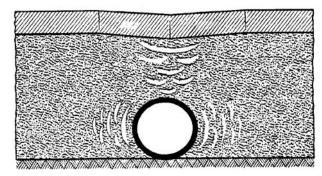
Pavement Failure Due to Inadequate Embedment Soil Compaction or Low-Quality Embedment Soil Adjacent to Flexible Pipe
